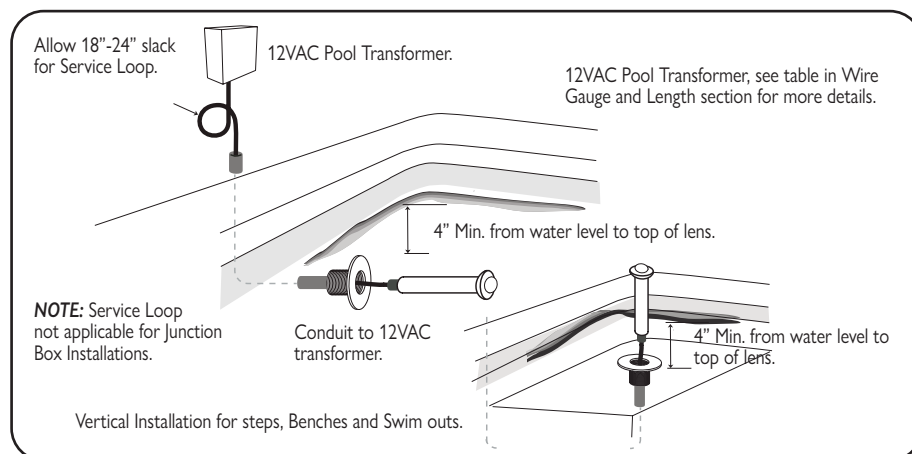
Standard Halco ProLED® Nicheless Light installation with 1.5" pool wall fitting.
